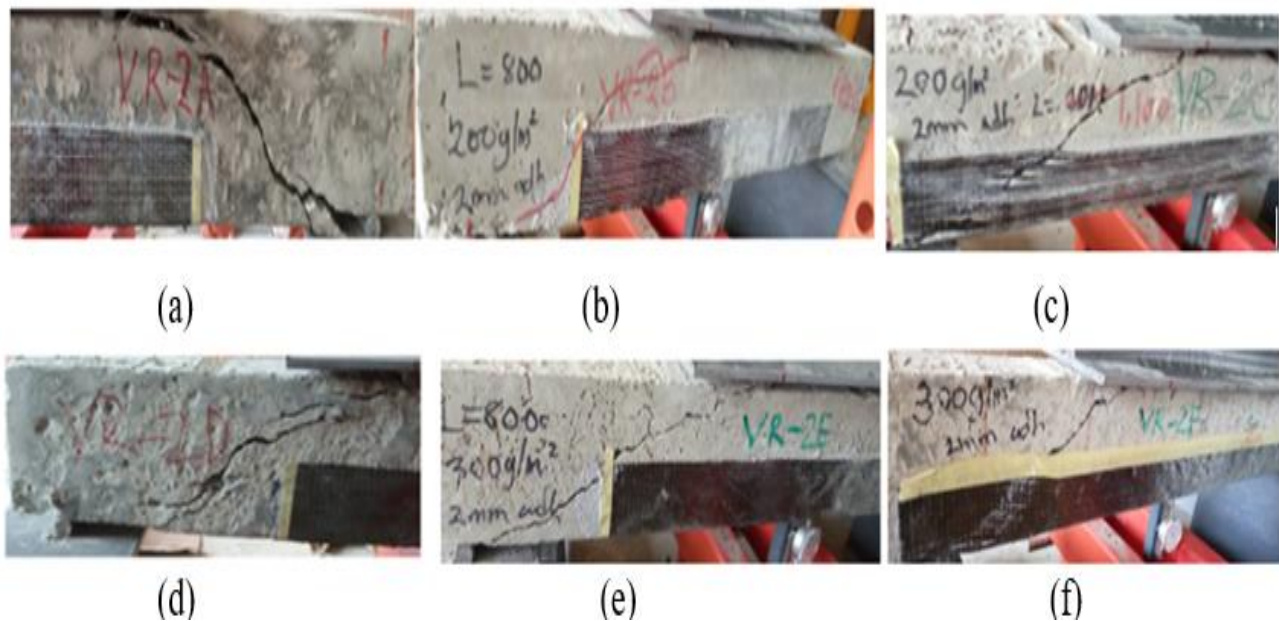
(a) Beam VR2A, (b) Beam VR2B, (c) Beam VR2C, (d) Beam VR2D, (e) Beam VR2E, (f) Beam VR2F
